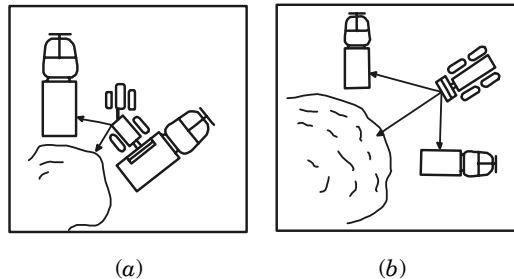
Loading arrangement with (a) Articulated, (b) Rigid frame loaders.
